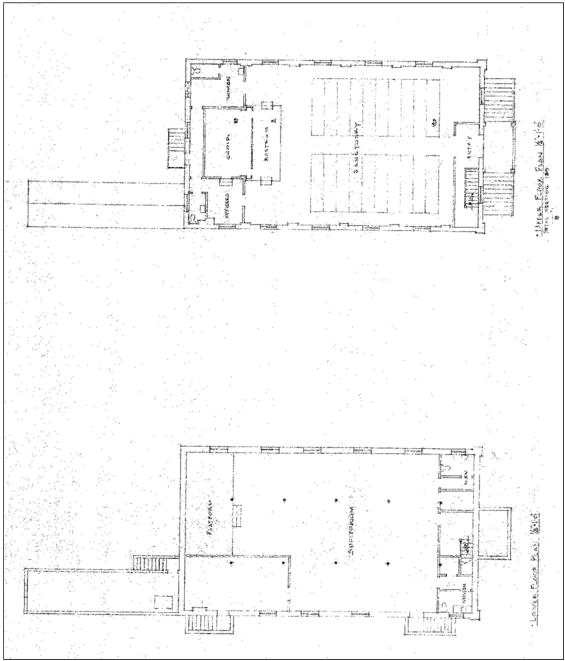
Anthony H. Andrews and J. B. Wooding, Existing Floor Plans, St. John's United Holy Church. No date (c. 1950) [St. John's United Holy Church]. These plans were drawn as part of the planning for the rear addition. They document the form of the church before the addition.
